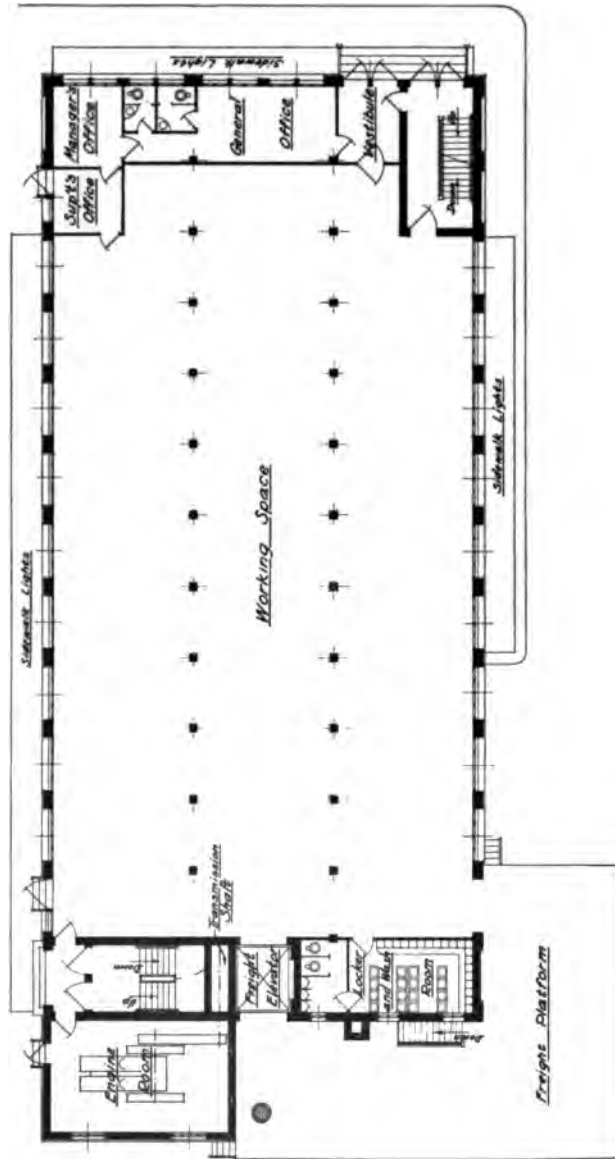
FACTORY BUILDING MILL CONSTRUCTION. FIRST FLOOR PLAN
